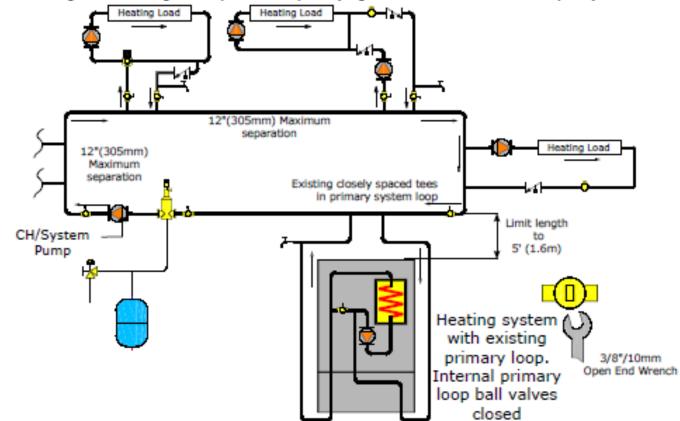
A Single Boiler Using Primary/Secondary Pumping With Closed External Primary Loop
